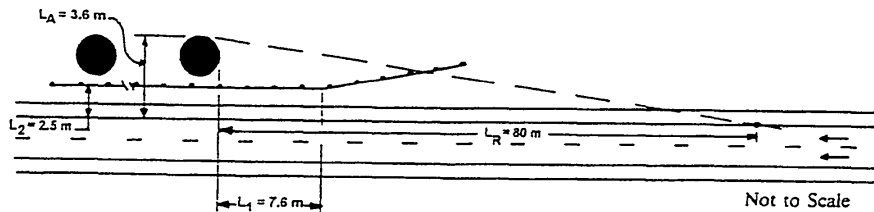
Example of Barrier Design for Bridge Piers
